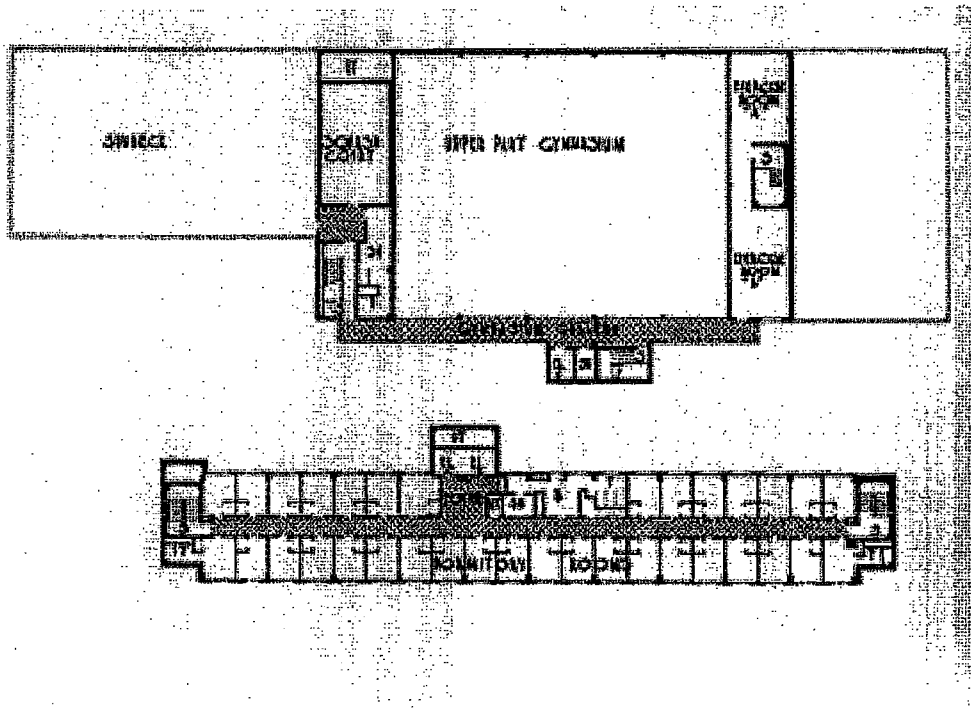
YMCA Floor Plan- Second Floor (scanned image)
